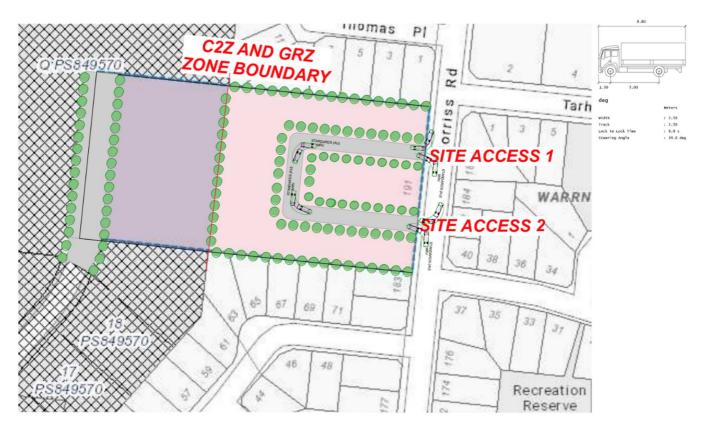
INTERNAL ROAD LAYOUT PLAN WITH SWEPT PATH ANALYSIS
